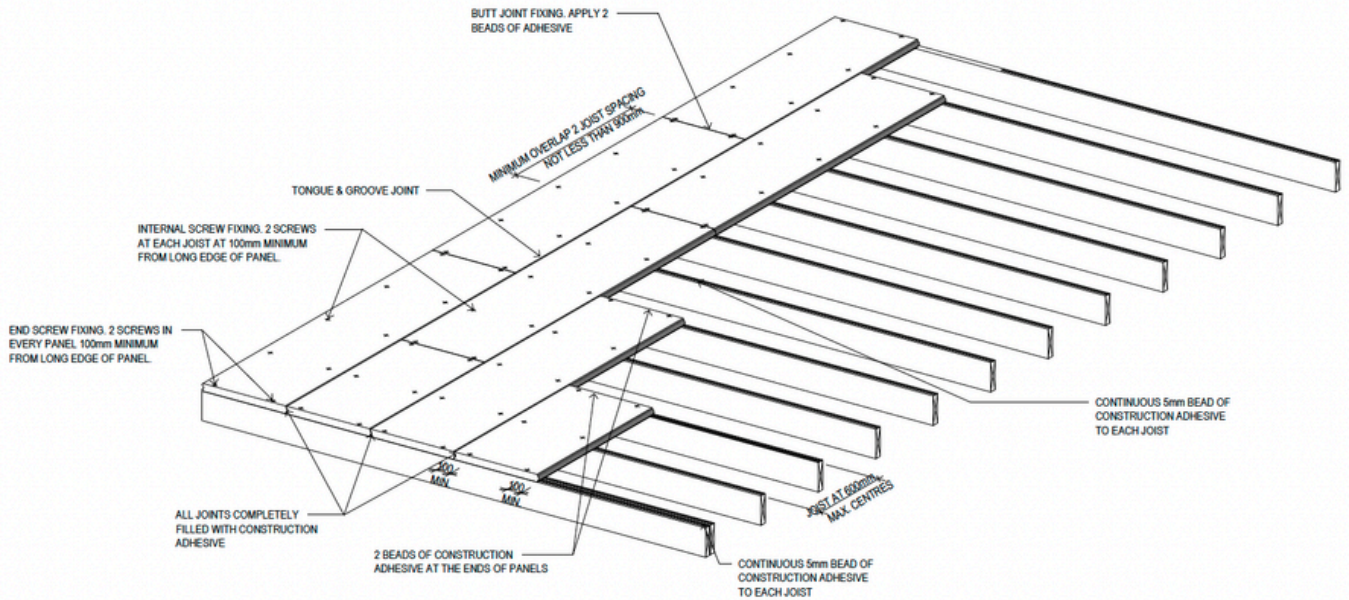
FLOOR SECTION - PERPENDICULAR TO JOISTS
